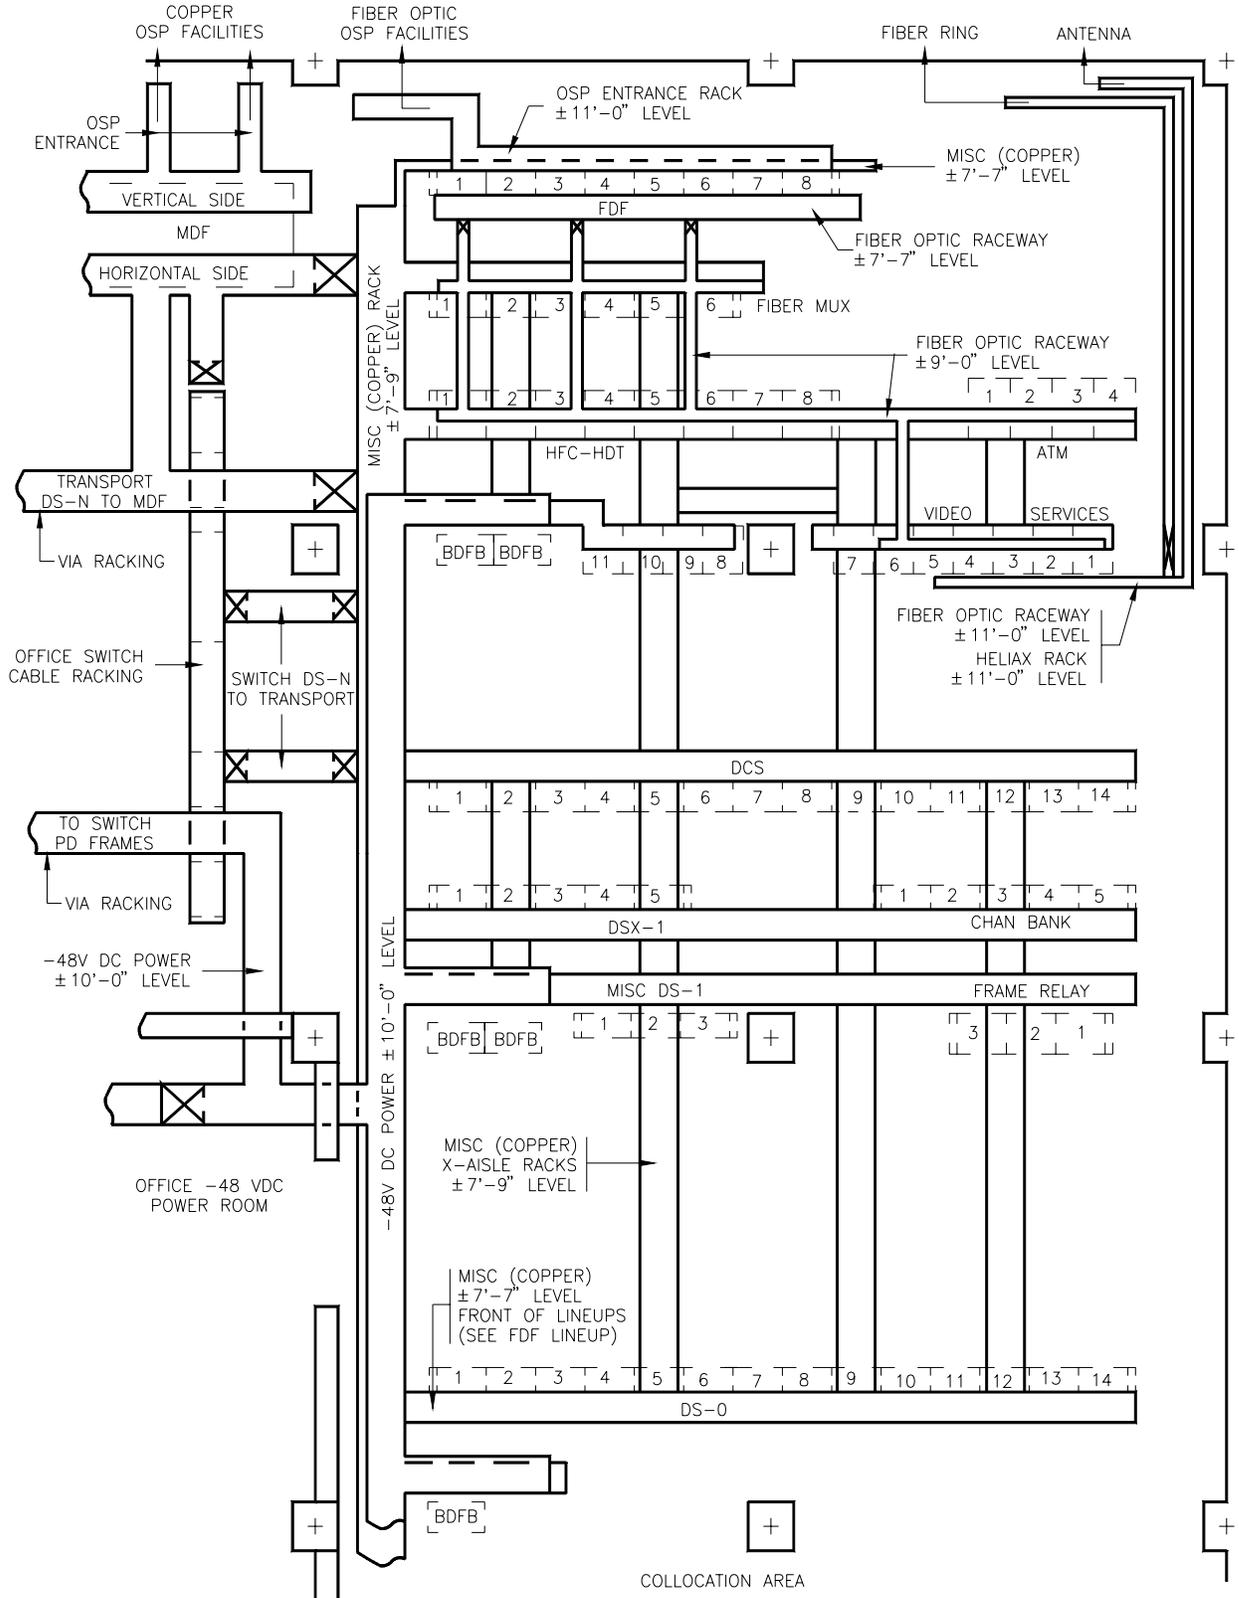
Typical Application Of Office Cable Racking To Figure 9-5 Floor Plan
